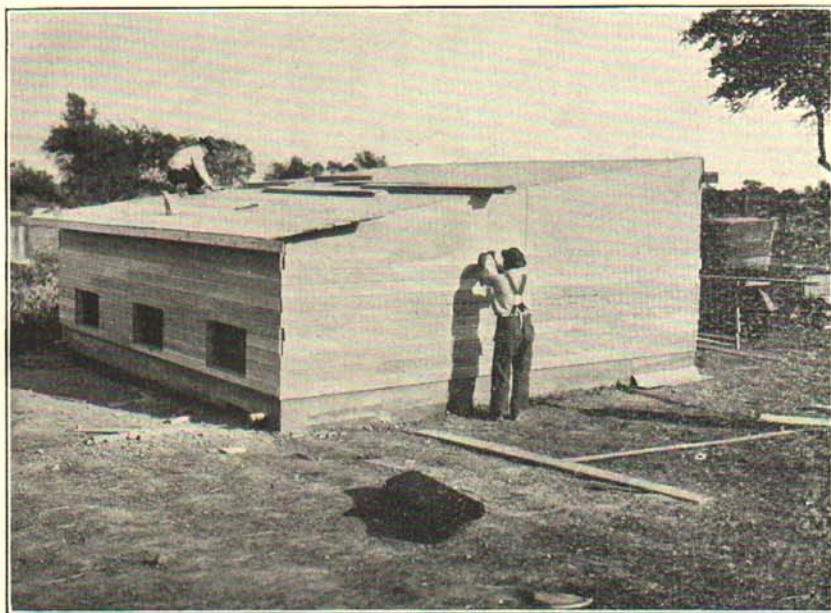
Insulated poultry house. Note insulation on outside of rafters and studs, and application of siding and roof boards direct to insulation.
